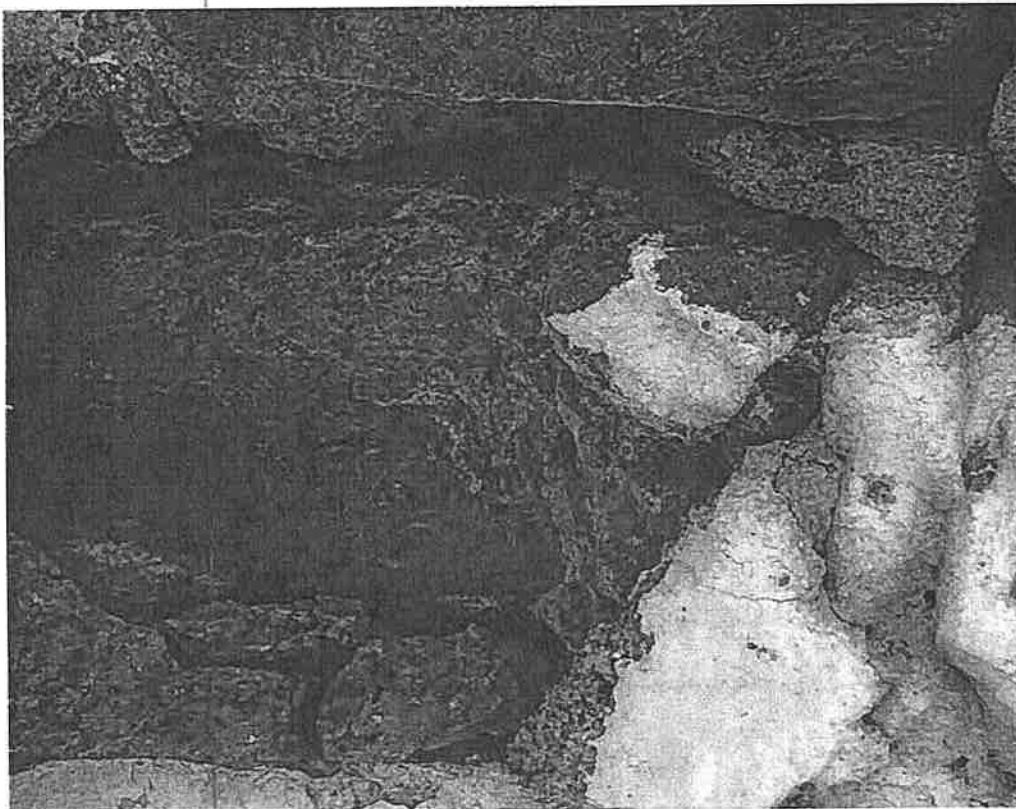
Close up of brick at side wall spall, showing freeze thaw damage to brick and cracked mortar.
